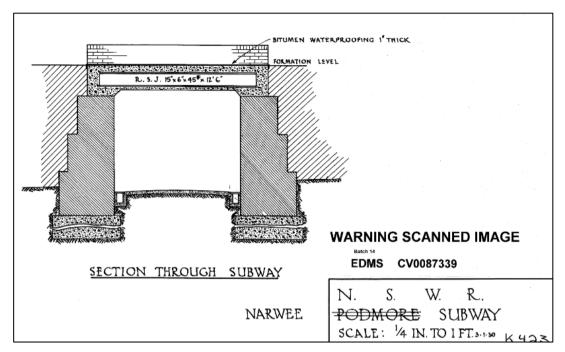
Original section plan of 'Podmore' (renamed 'Narwee') Station pedestrian subway (Source: Sydney Trains Plan Room Ref.0087339_00c)
